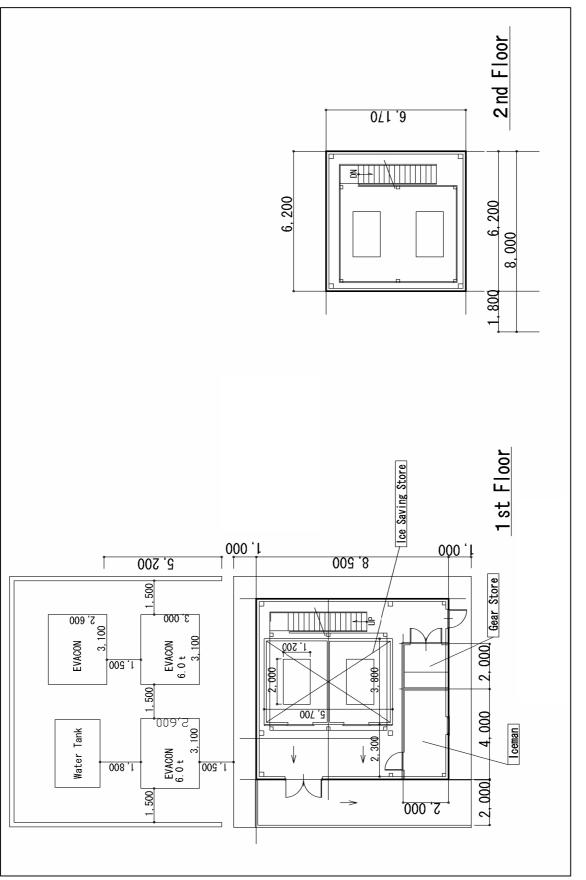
(12) General Layout Plan (Bel Ombre)
